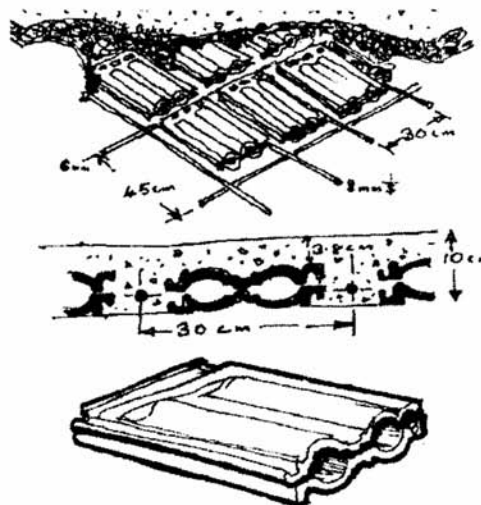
Schematic representation of filler slab with M.P. tiles as filler material
